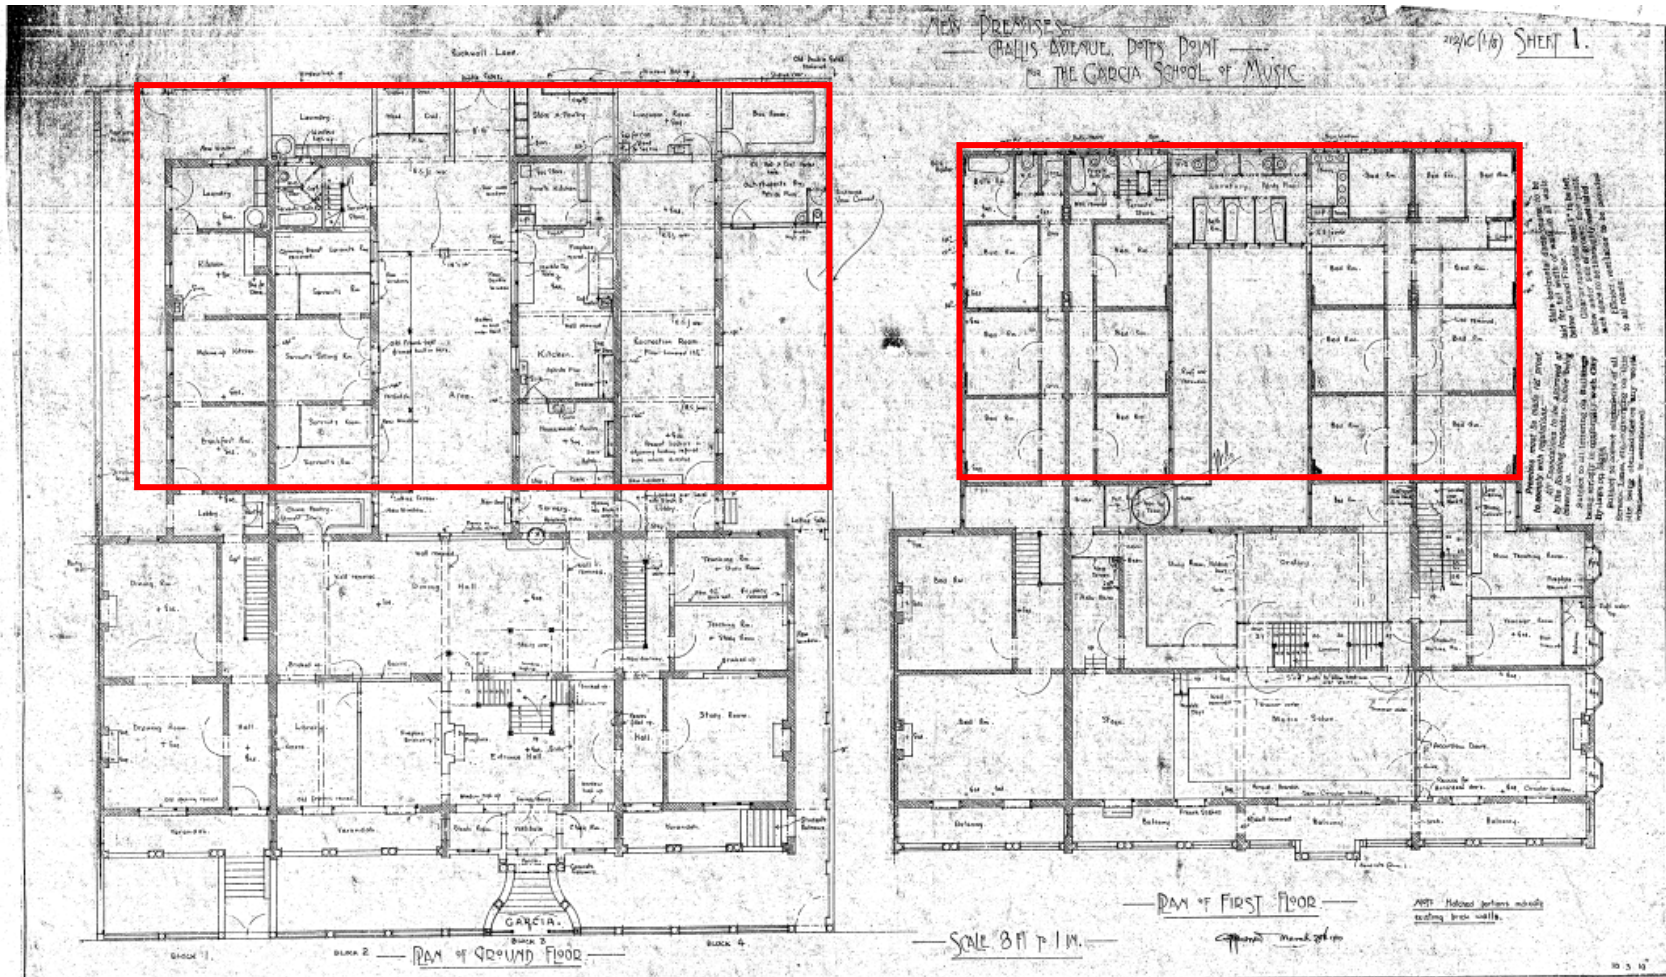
Original Architectural Drawing – Ground and first floor plan - Garcia School of Music (Source: City of Sydney Archives) The rear wings were demolished in 1998 (outlined by red rectangle)
